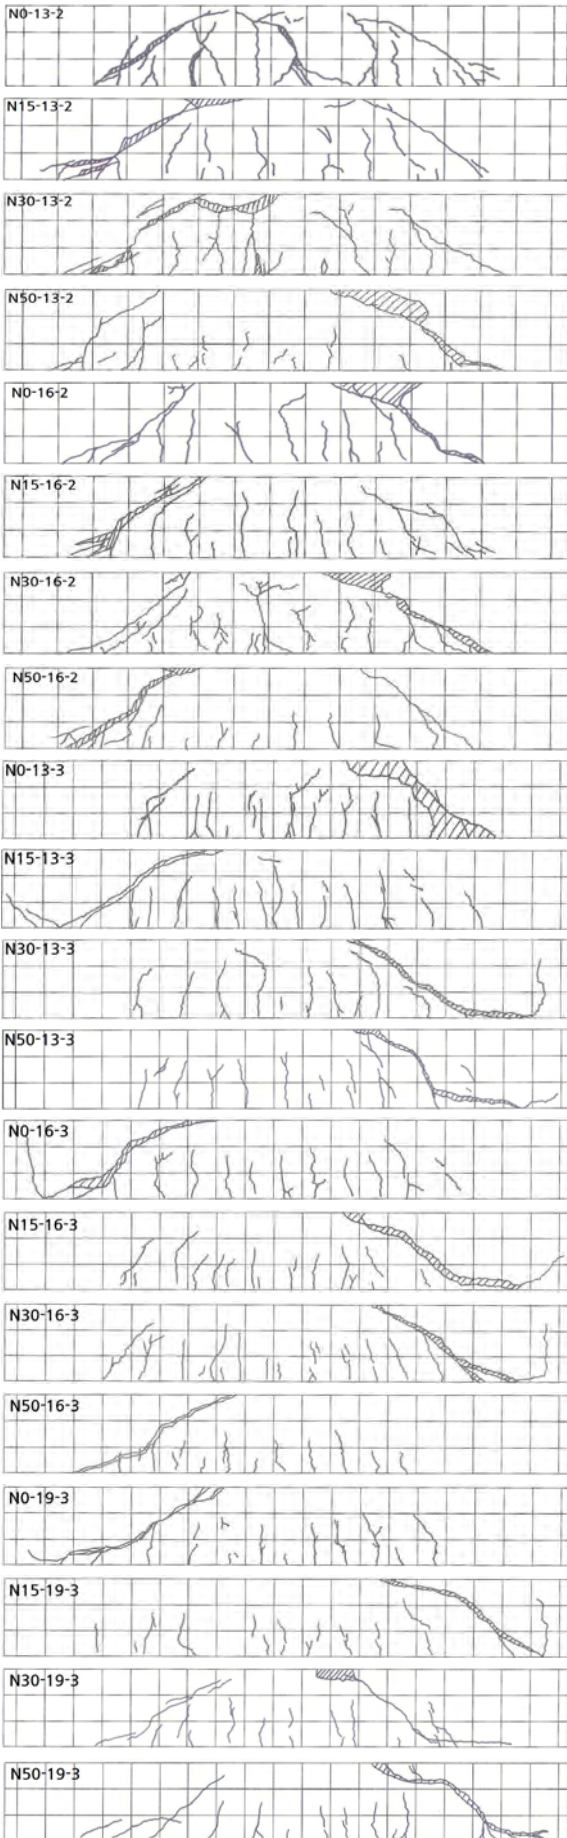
Crack and failure mode of specimens (a/d=2,3)
